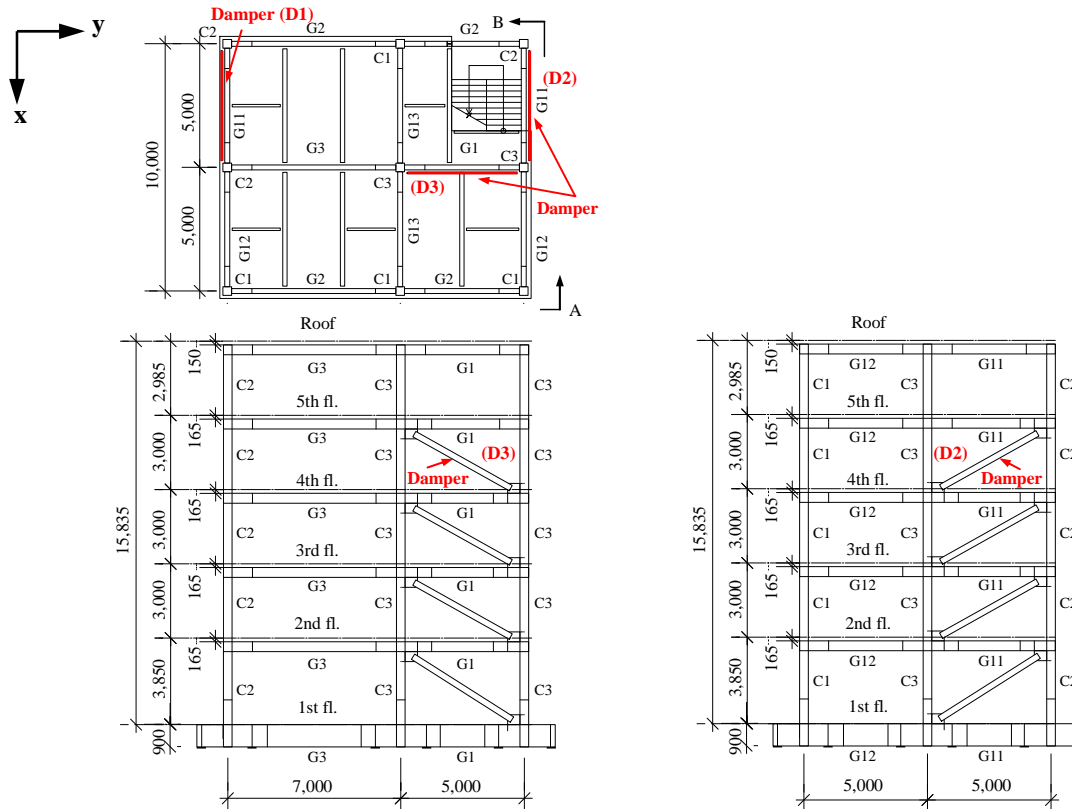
Plan and elevations for full-scale 5-story building specimen.
